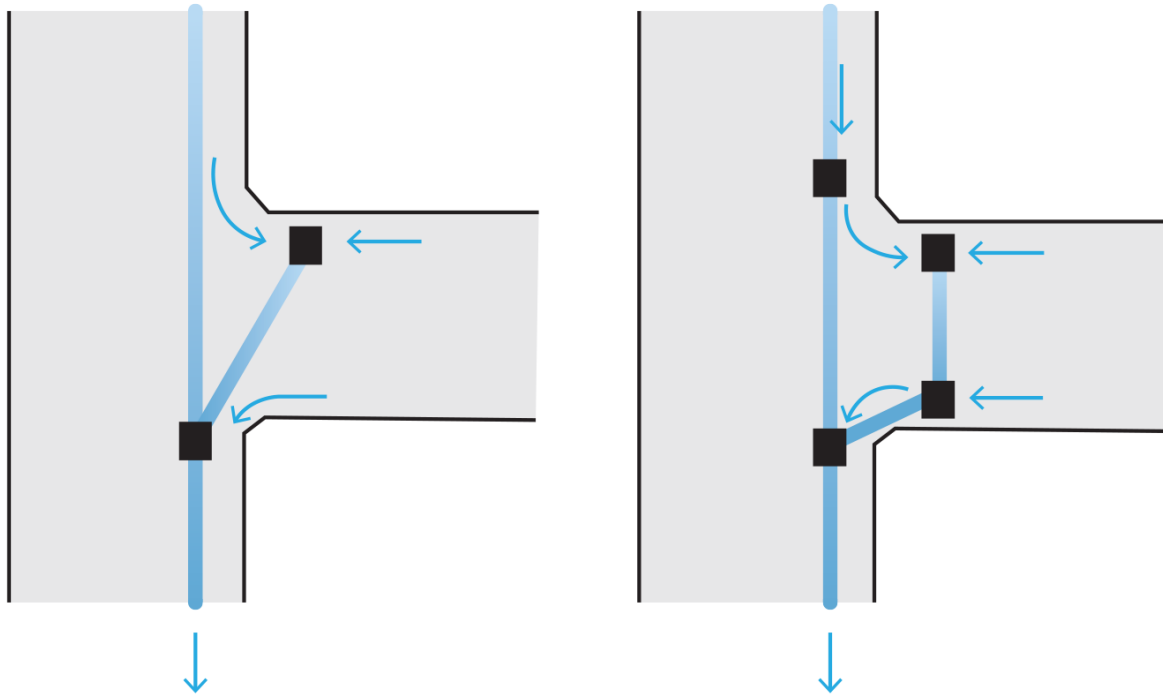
Example of Alternative Configurations of Inlet Pits at a Road Intersection
